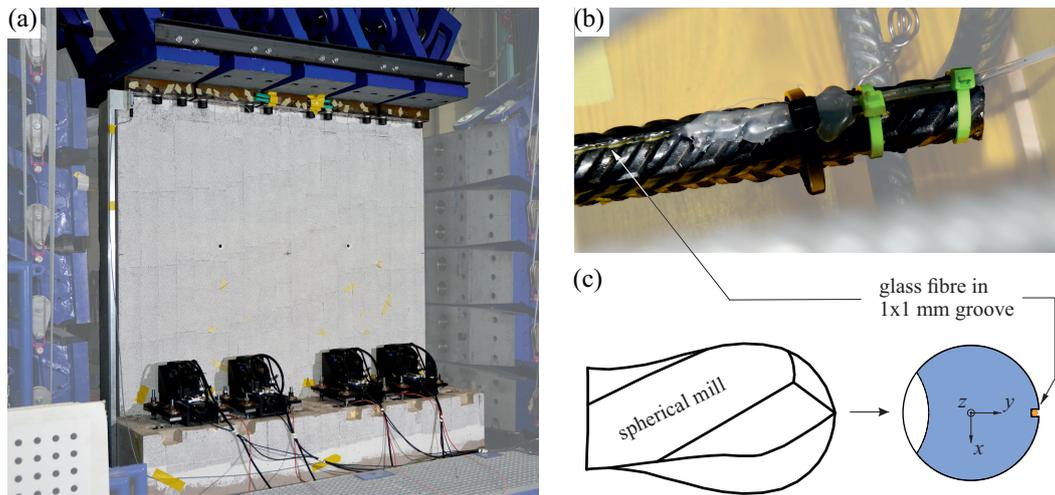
Test setup and detail of instrumentation: (a) specimen in the Large Universal Shell Element Tester (LUSSET) with installed drilling machines for hybrid test; (b) glass fibre glued in groove, with adjacent transition zone where the fibre continues in protecting tube; (c) location of fibre in the reinforcing bar with respect to drilling direction, with global coordinate system shown for reference.
